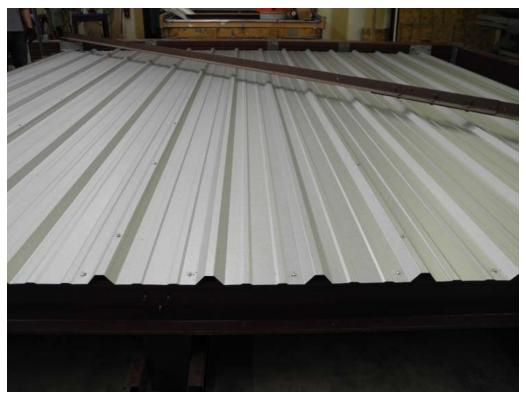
View of panel and sidelap fasteners at end and interior supports (Tests #1 & 2). (DSCN3180)
